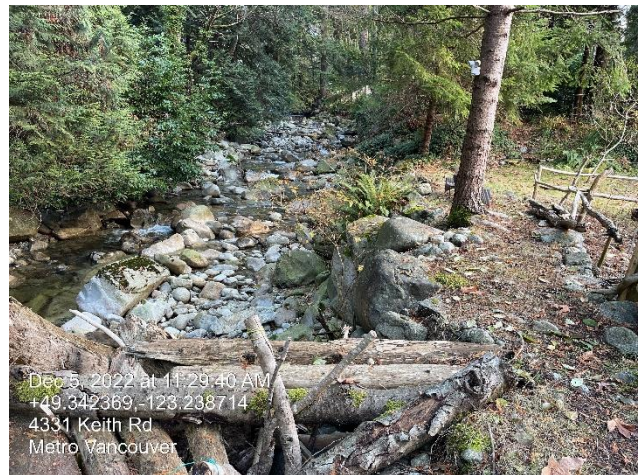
East view of Cypress Creek; retained rock wall pictured right.
